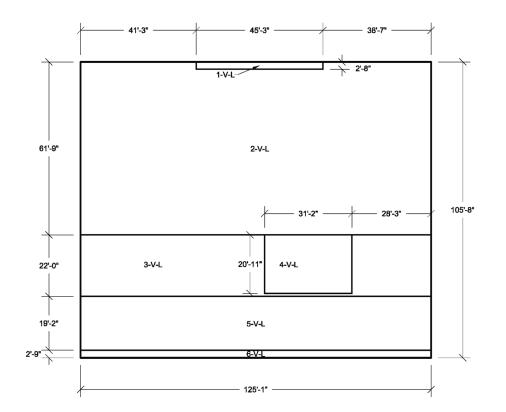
H.3-24 West Wall Looking East Vertical Reinforcement Zones Near Side Face
